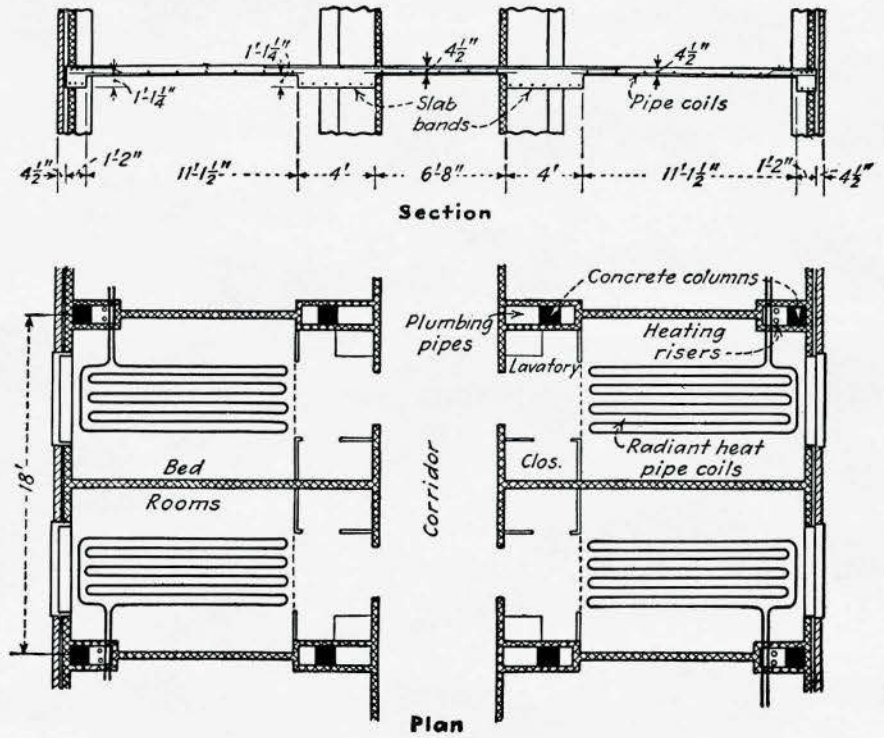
Typical bay framing in Bellevue Nurses Home in New York utilizes a slab band instead of a beam, so placed as to be inconspicuous in the room. Heat coils are buried in 4½-in. floor slab.
